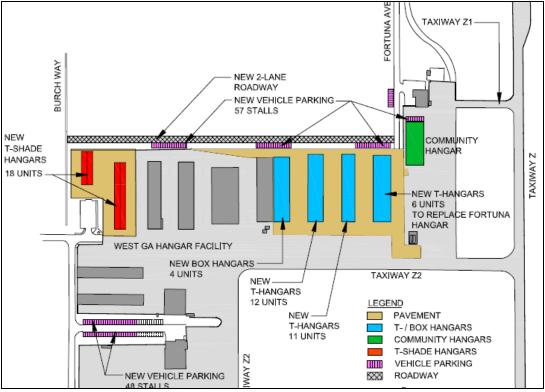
FBO and GA Facilities Development, GA Facilities Expansion, Alternative 1
